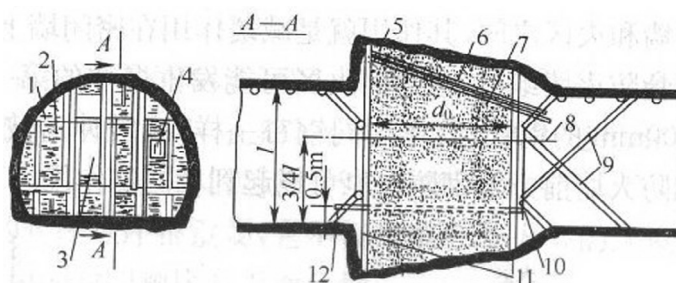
Gypsum blast resistant seal wall. 1—Sampling tube; 2—temperature measuring hole; 3—testing hole; 4—U-shaped differential pressure gauge; 5—gypsum filling material outlet; 6—filling tube; 7—supply tube; 8—air sampling tube; 9—support frame; 10—drainage tube; 11—wooden board support; 12—mesh cover
